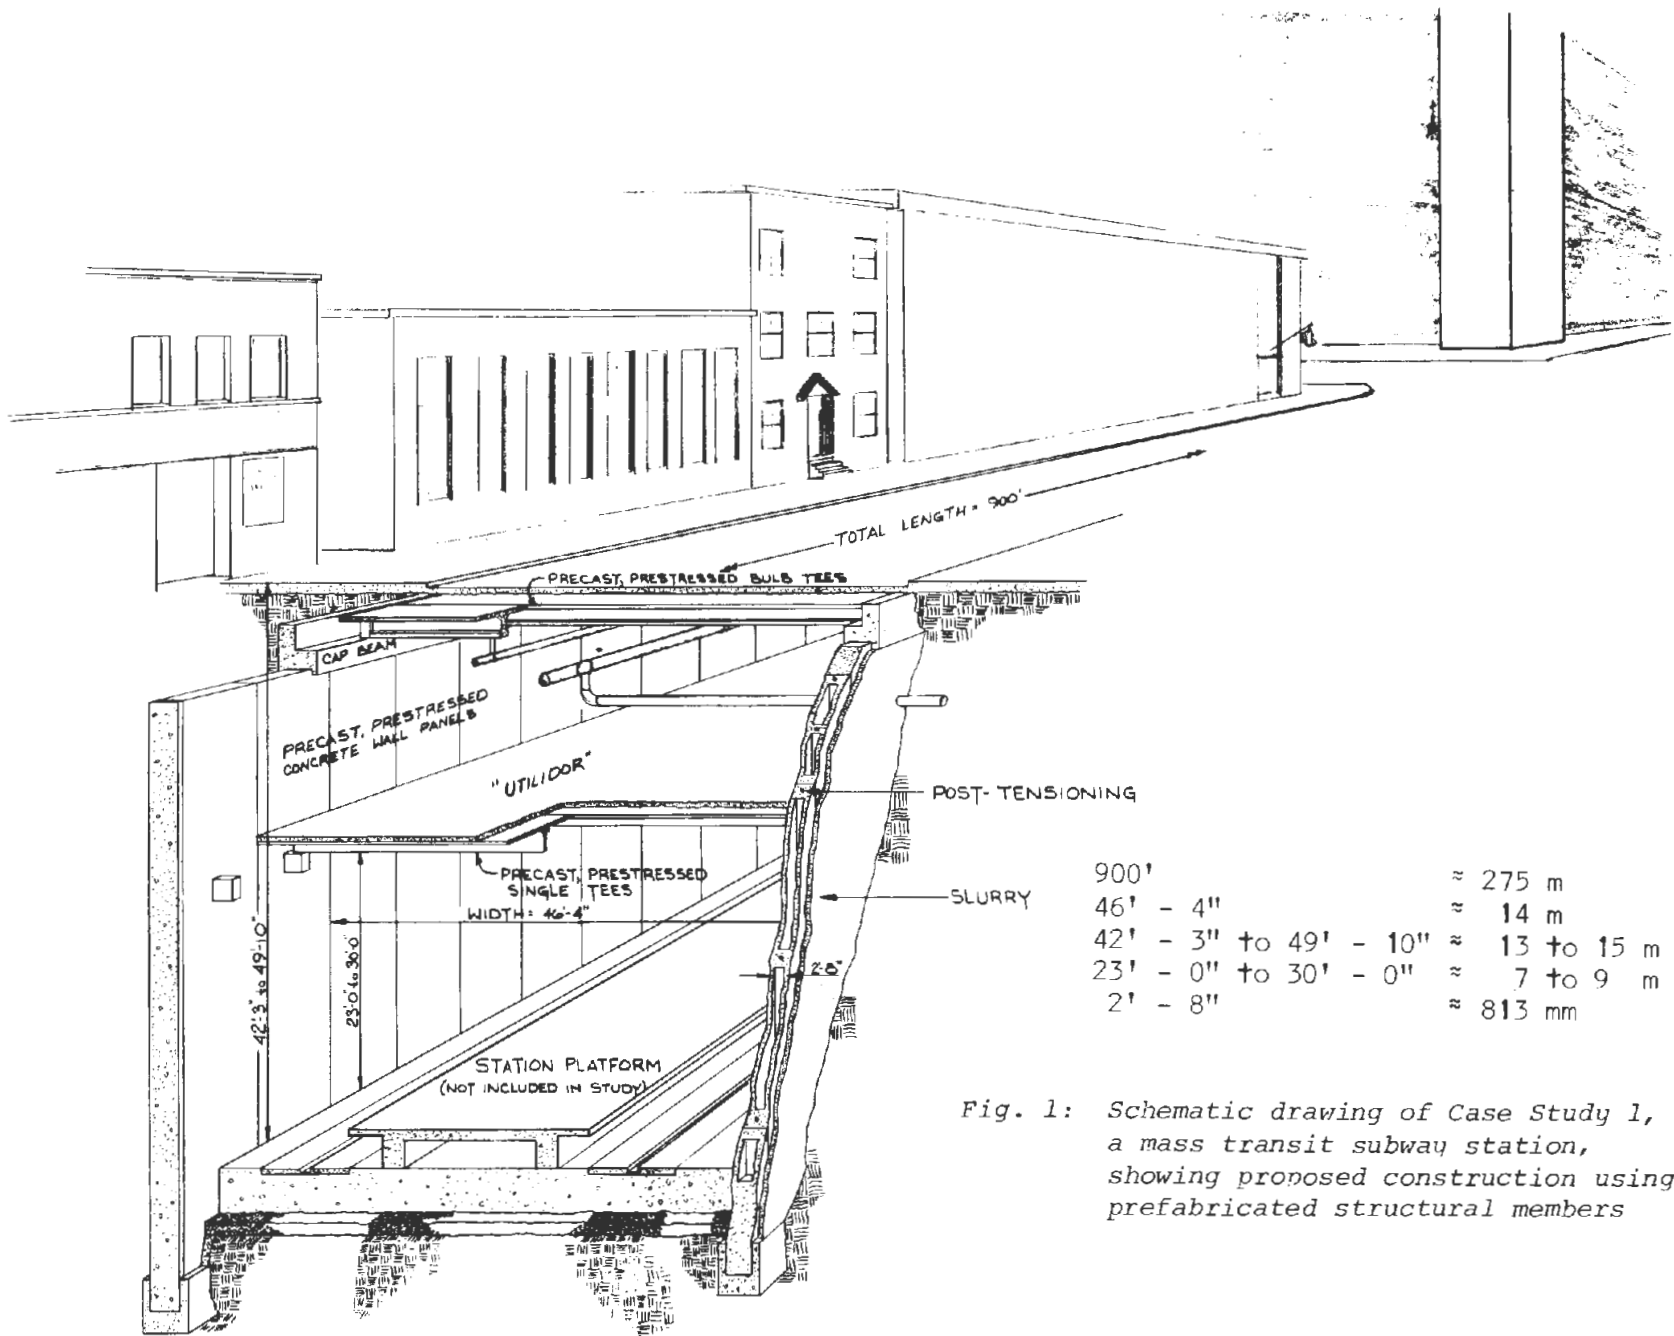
Schematic drawing of Case Study 1, a mass transit subway station, showing proposed construction using prefabricated structural members
